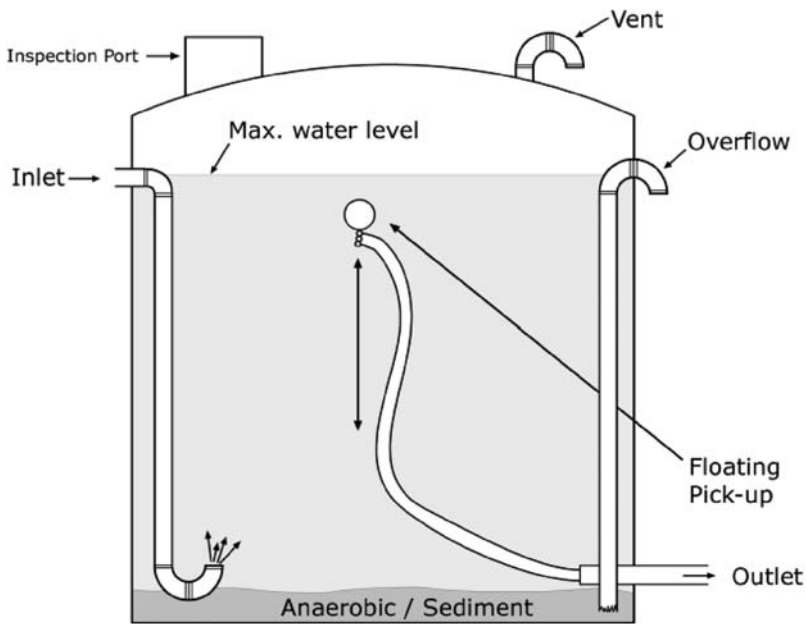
Typical rainwater storage tank piping with ‘quiet inlet’. (Source: WC3 Design, 2013).
